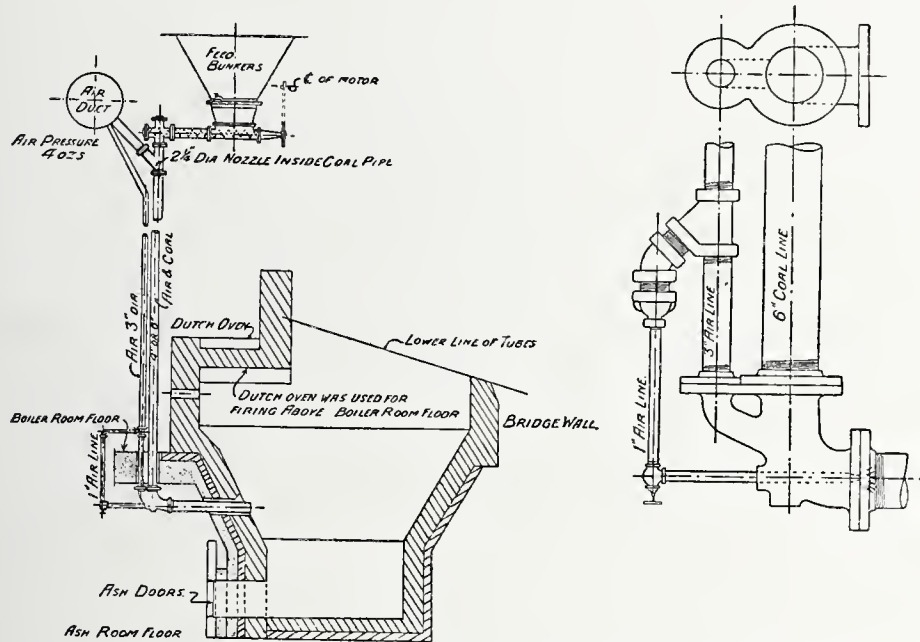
Arrangement of Santmeyer Burner and Boiler Combustion Chamber.
